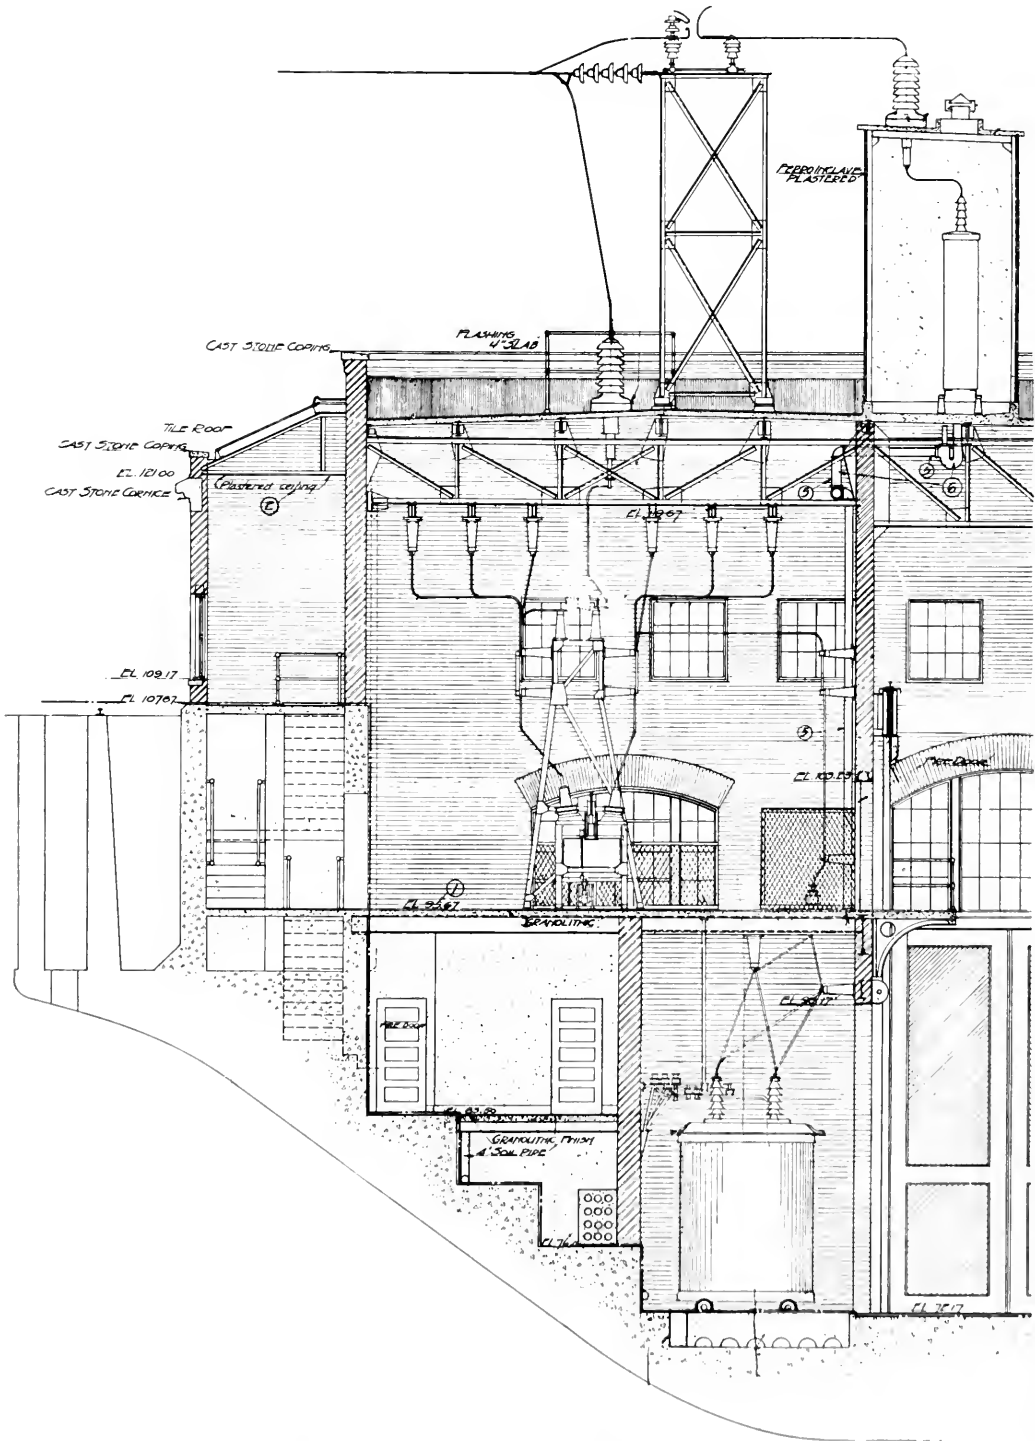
Cross Section Through the Transformer and High-tension Switch Room
